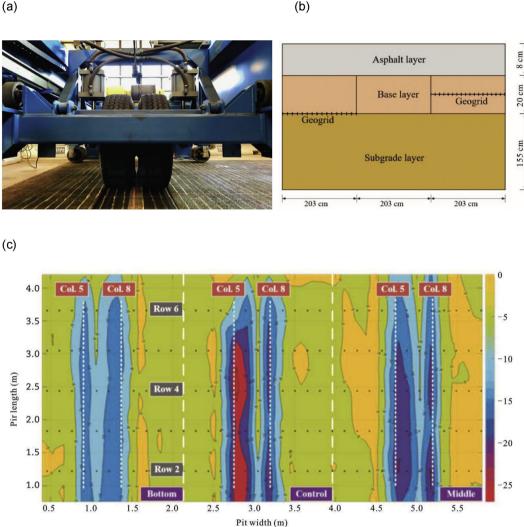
APT device, pavement structure and permanent deformation after APT. (a) Accelerated pavement loading system. (b) Schematic diagram of pavement structure. (c) Distribution of accumulated surface permanent deformation (Han et al, 2020).
